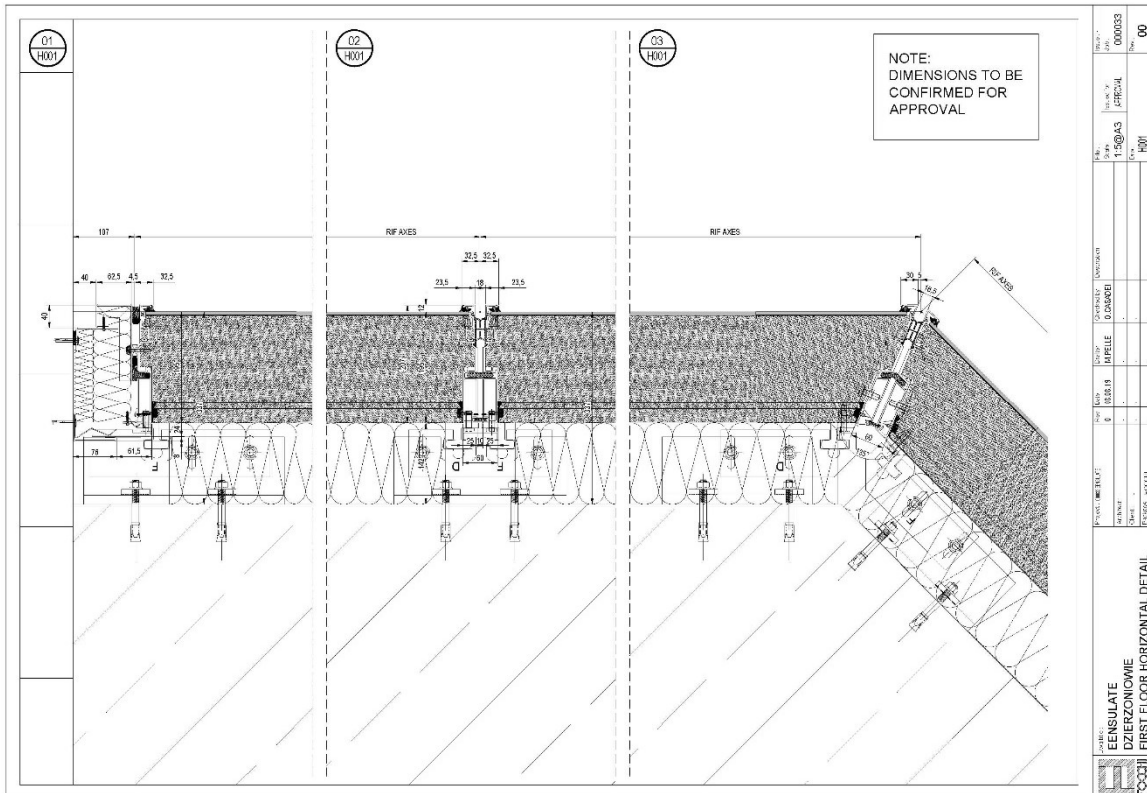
Polish Primary School: Curtain wall detail 1 (first floor horizontal detail)
